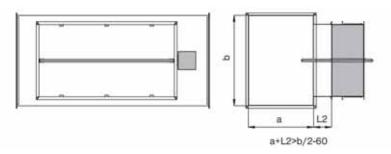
Horizontal damper fitting on the duct- EN 1366-9
